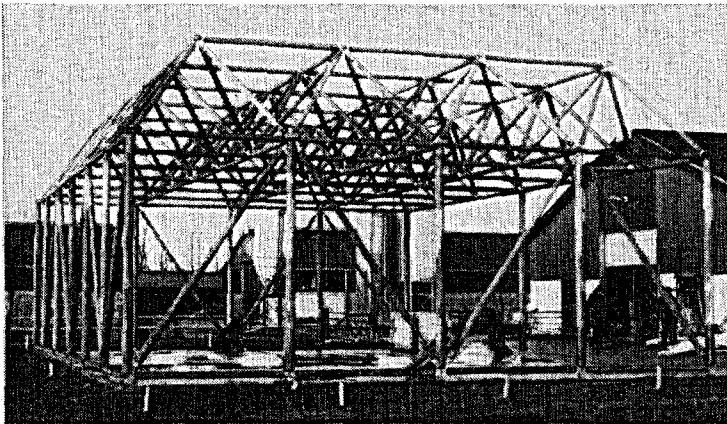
Example of a space structure of roundwood with a roof deck out of identical struts and having a configuration based on tetrahedra and half — octahedra.
